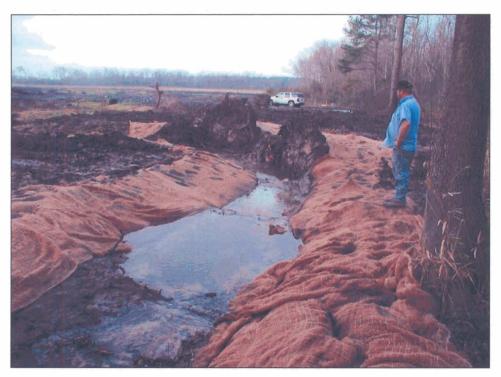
Root wads and coir fiber matting installed around a meander bend for bank stabilization and habitat improvement.
